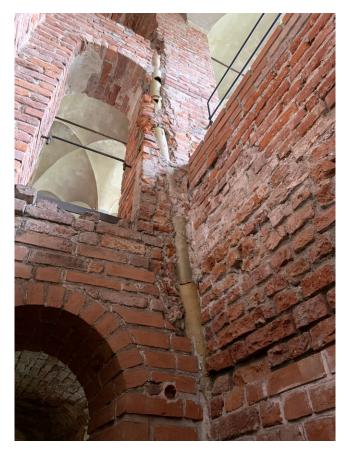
Filarete. Ospedale Maggiore, male ward, terracotta ventilation pipe, 1456–76, Milan. Author's photo.
